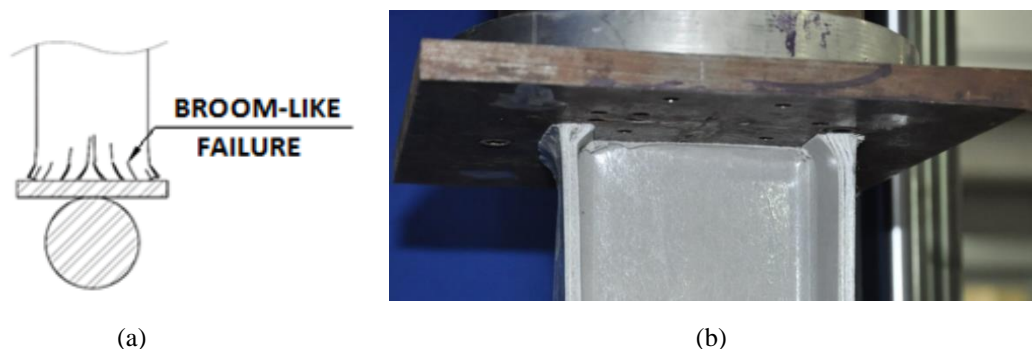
End crushing of the tested stub I2.ES.06.550: (a) broom-like failure illustration; (b) stub wall's end
